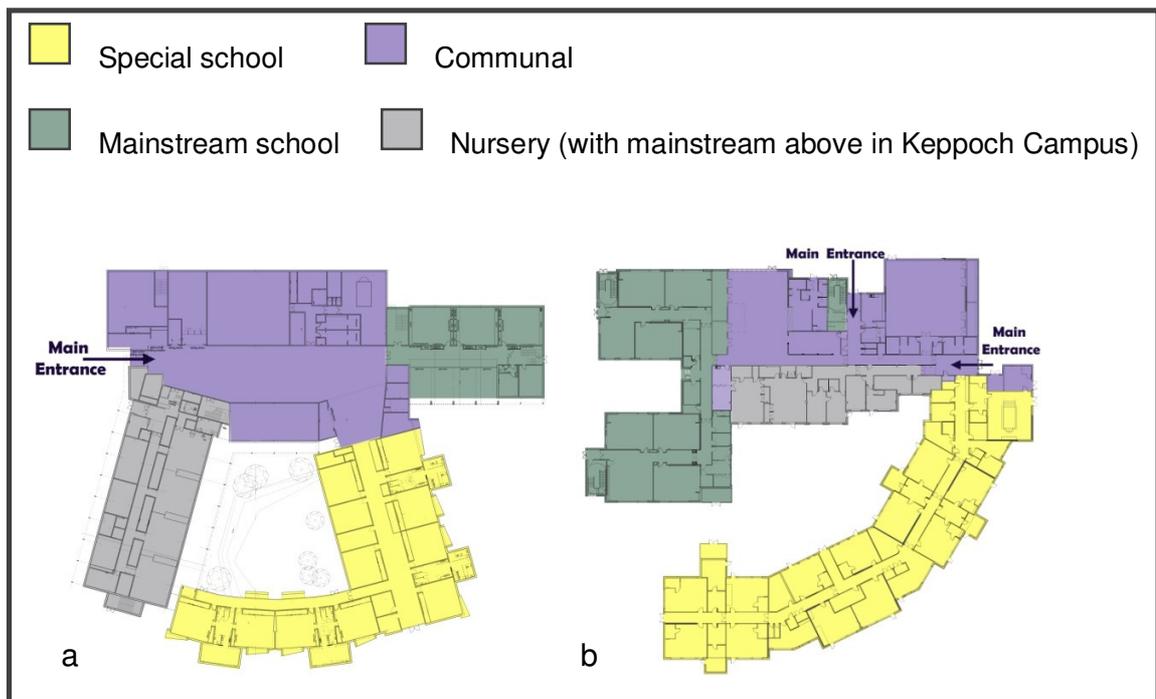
Diagram showing the layout of (a) Keppoch Campus & (b) Langlands School and Crookston Castle Primary. Floor plans sourced from:
